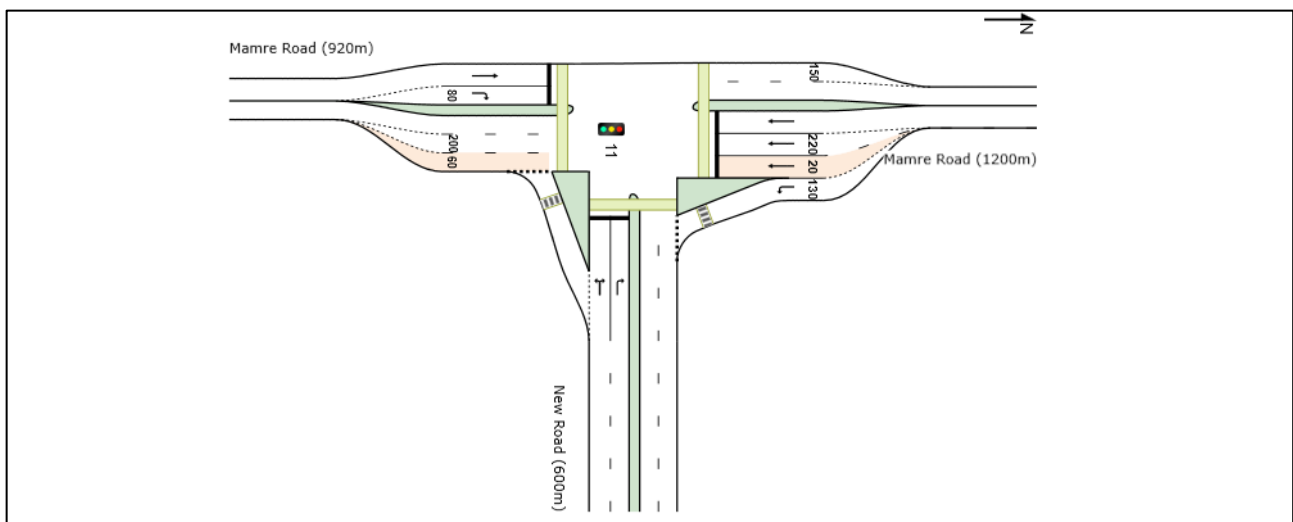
Interim Mamre Road / Mirvac Access intersection Layout
